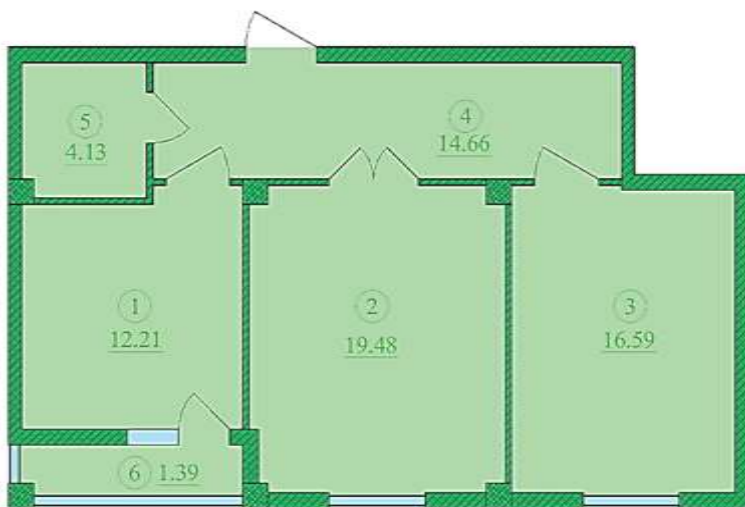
Planning scheme of the surveyed apartment: 1 - kitchen room; 2 - hall; 3 - bedroom; 4 - hallway; 5 - bathroom.
